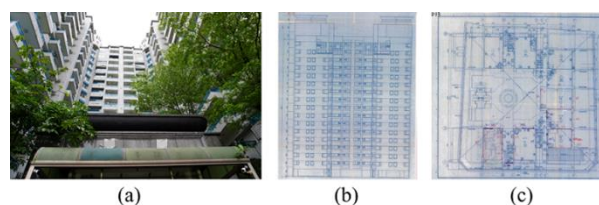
(a) street view, (b) elevation view, and (c) plan view of Building D13.
